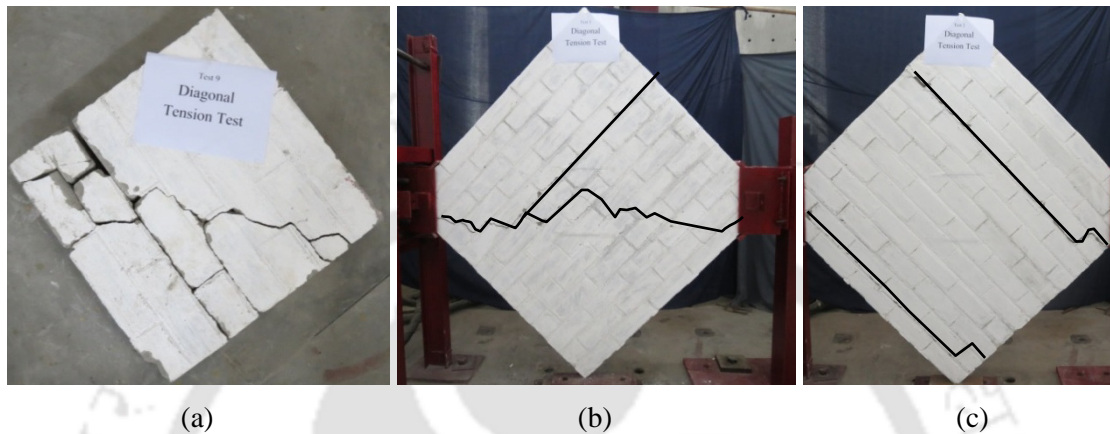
Failure mechanisms in masonry wallettes: (a) diagonal shear cracking and sliding of bed joint (half-scale specimen); (b) diagonal shear cracking and sliding of bed joint (full-scale specimen); and (c) sliding of bed joint (full-scale specimen).
